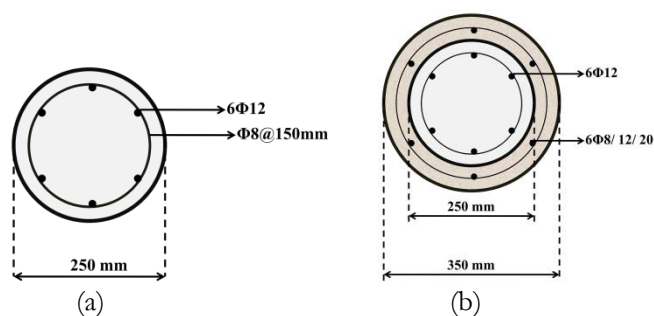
Detail of circular columns: (a) reference (R) column; (b) strengthened columns with reinforced concrete or ECC jacketing.
